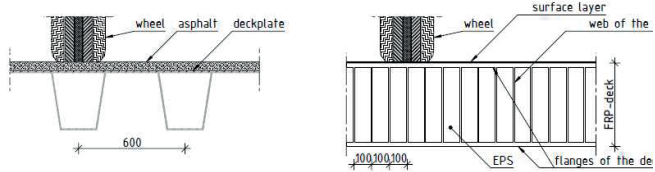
wheel load on the steel deck (left) and the FRP-deck (right)
